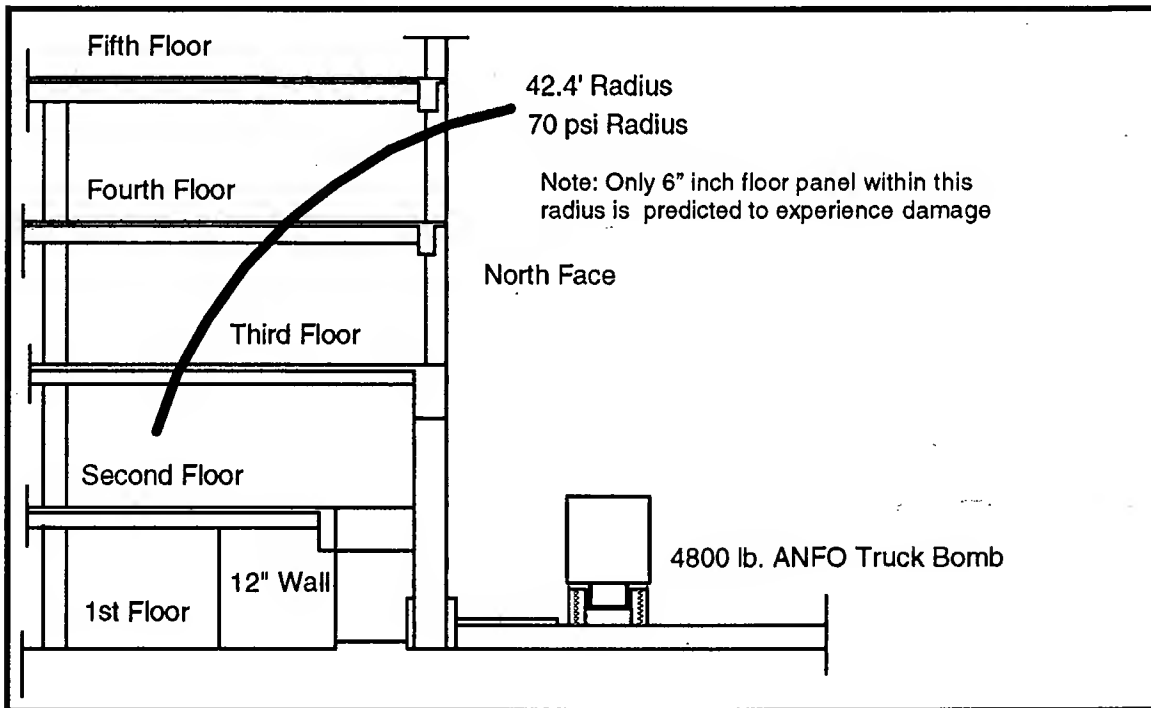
Cross section of the Murrah Federal Building showing the relation of the truck bomb to the structure and floor panels
